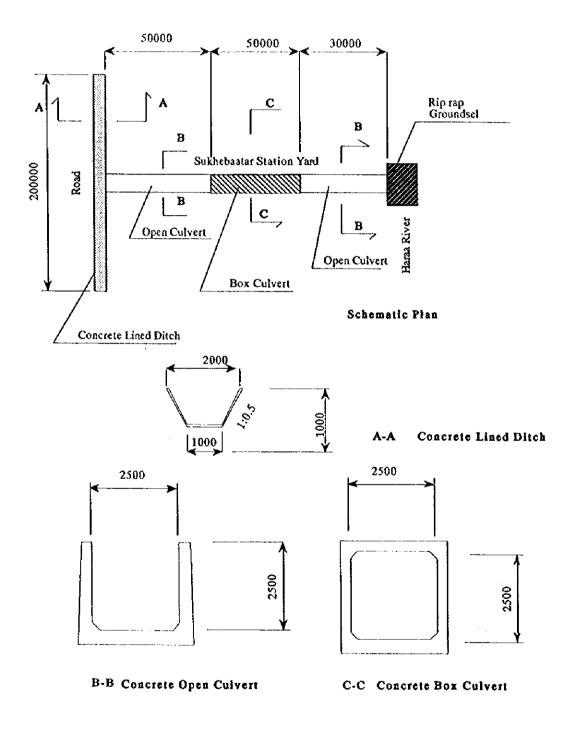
Drain Improvement Plan for Sukhe-baatar Station Yard
